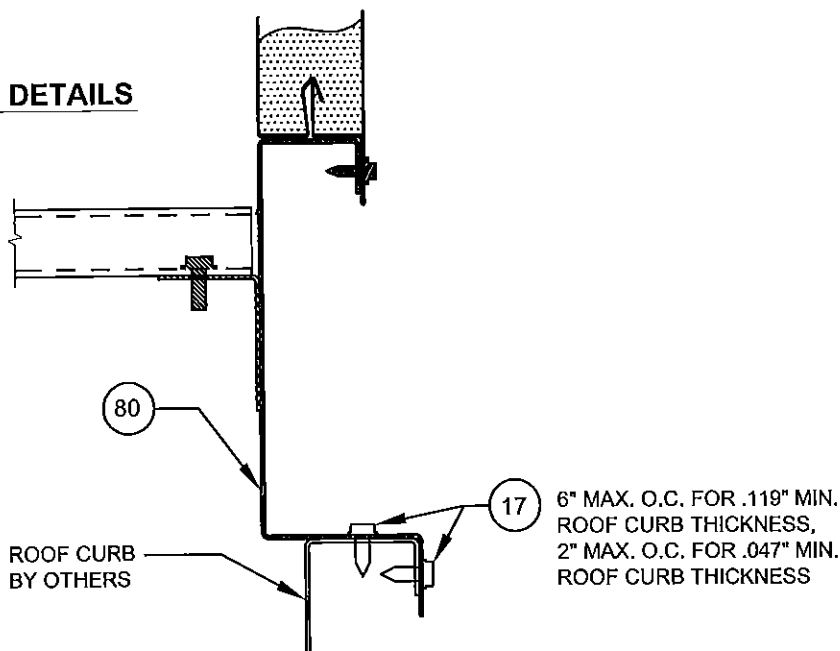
DETAIL B. TYPICAL INSTALLATION BASE RAIL TO CURB
